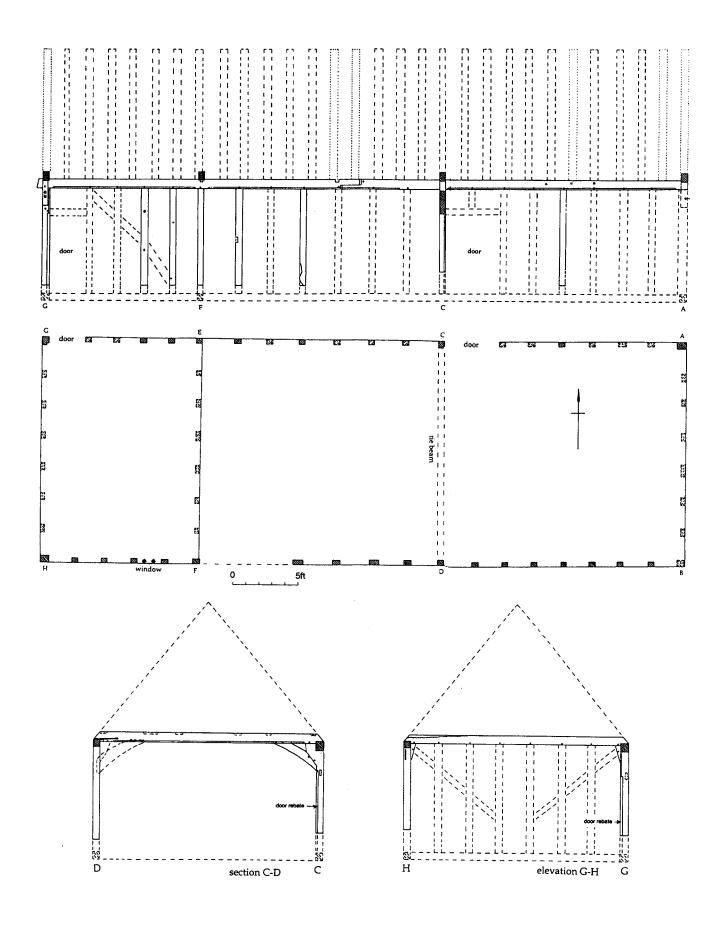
Stanway, Beacon End farmhouse, probable stable building, now demolished.
